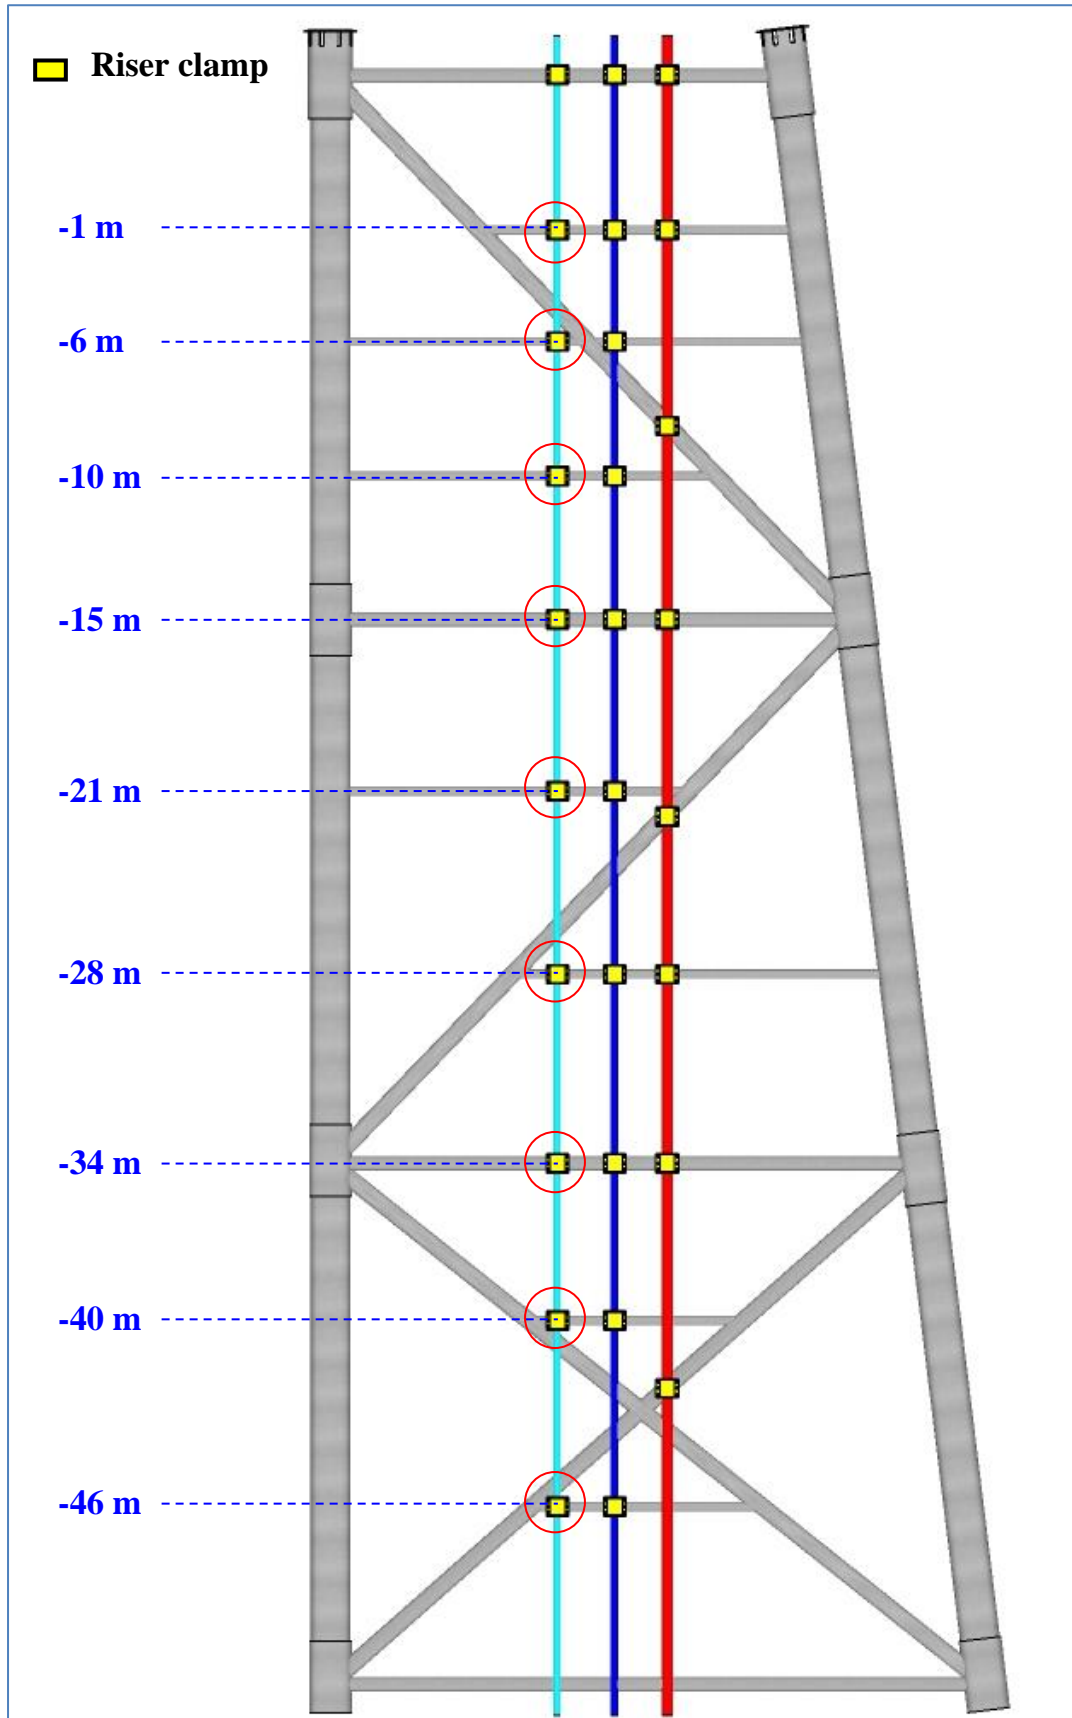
Elevation view of Riser and riser clamp position at RC.RB1
